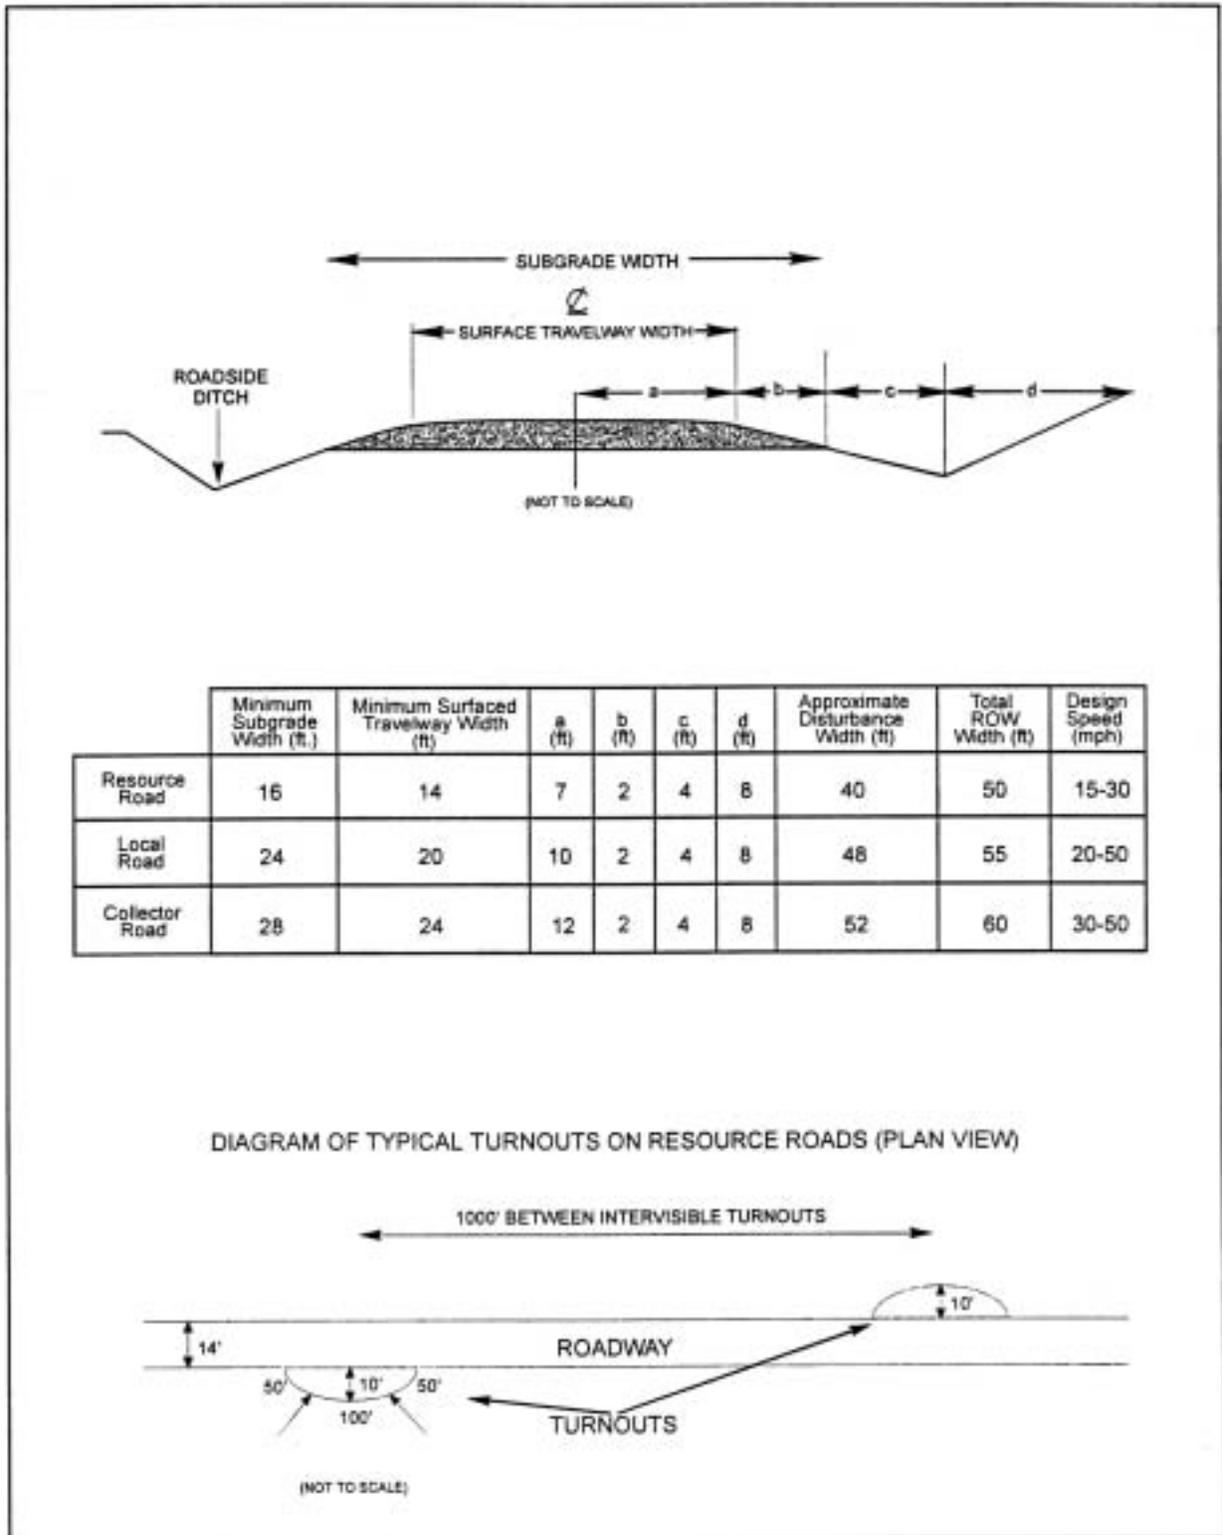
Typical Roadway Cross-Section with Width Specifications.
